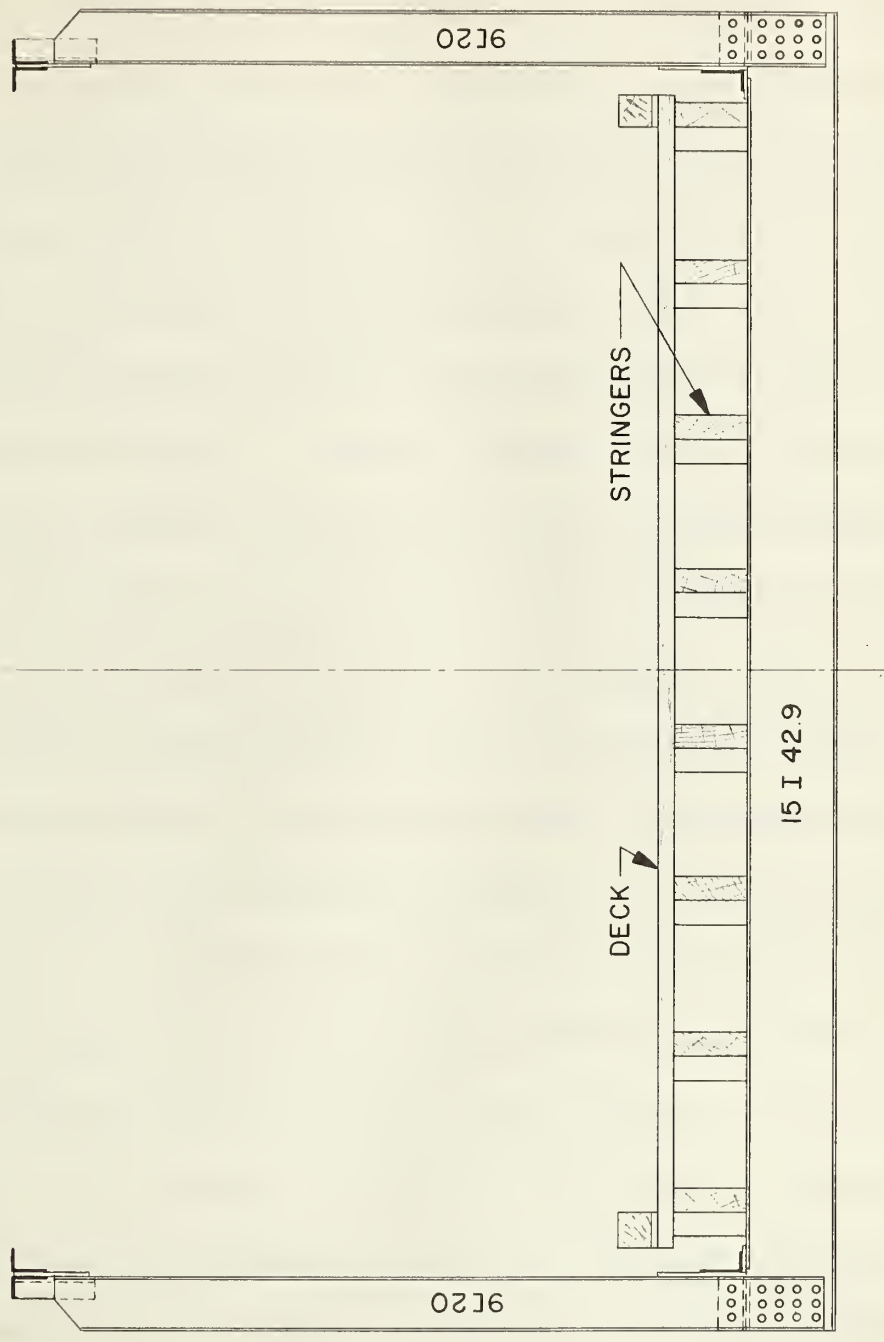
CROSS-FRAME OF TEST BRIDGE
